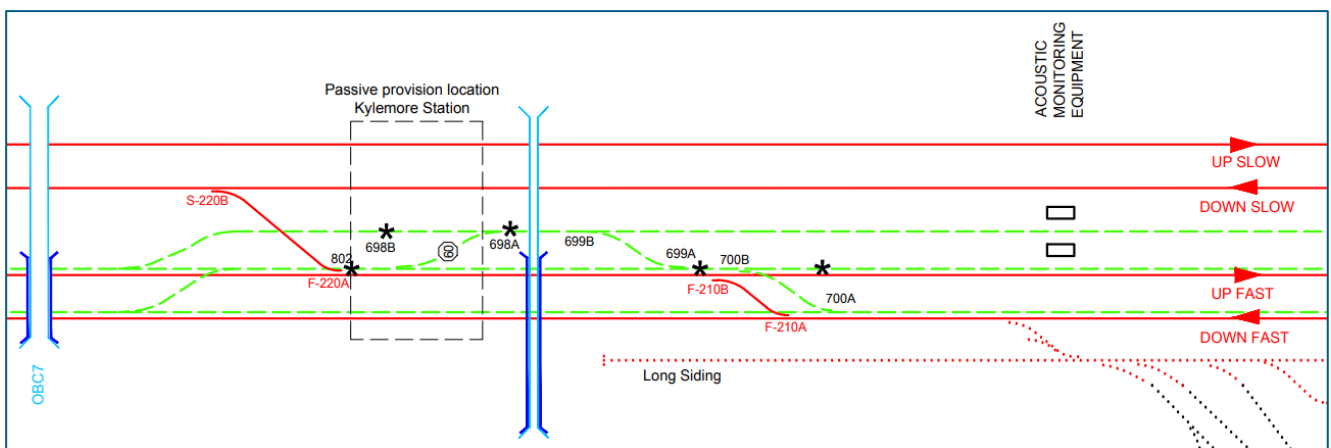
Le Fanu Road Bridge (OBC7) to Kylemore Road Bridge (OBC5A) – Track Plan Layout
